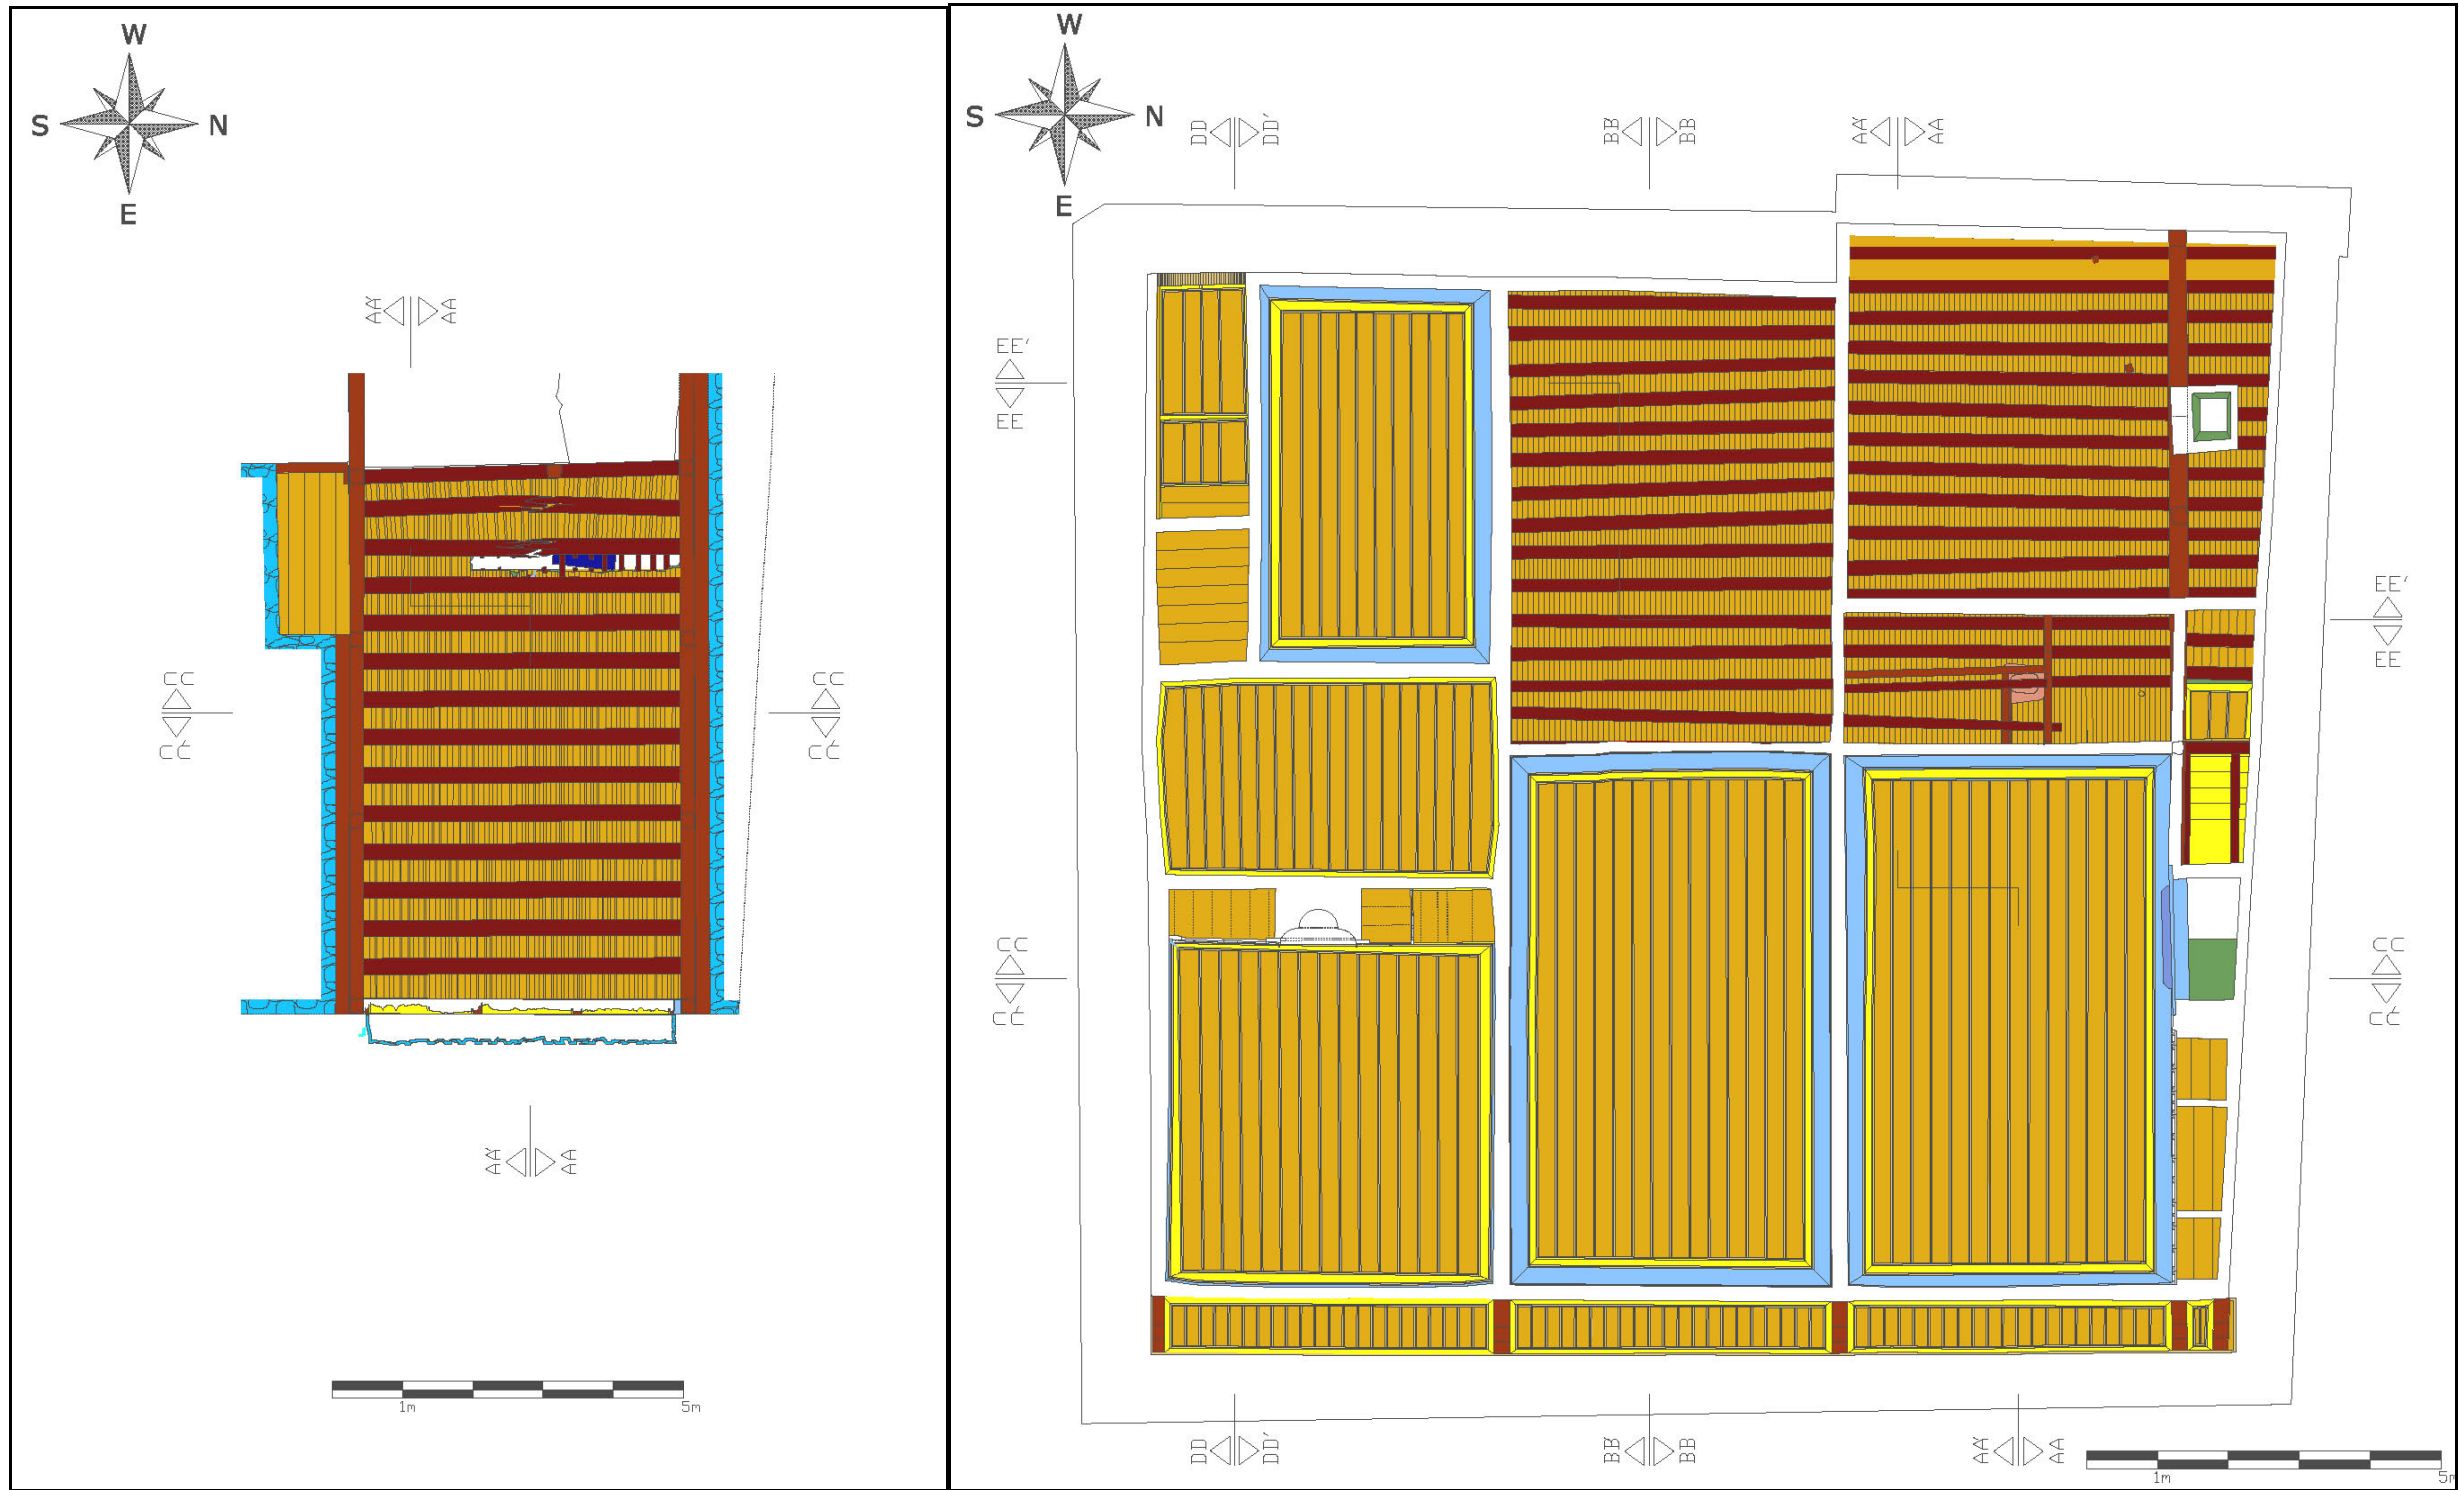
Analysis of Mat.1-Basement Floor Reflected Ceiling Plan; Scale: 1/100 (Presented in 1/50 at Jury) Figure 59: Analysis of Material-Ground Floor Reflected Ceiling Plan; Scale: 1/100 (Presented in 1/50 at Jury)
